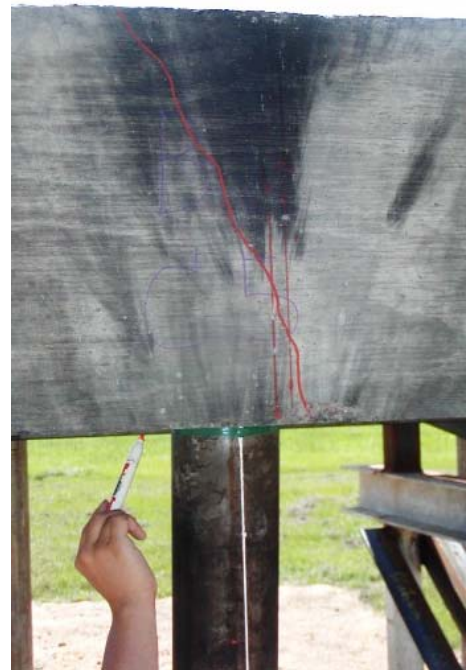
Cracking at Cap-beam of Column B1-C5 after Test 5
